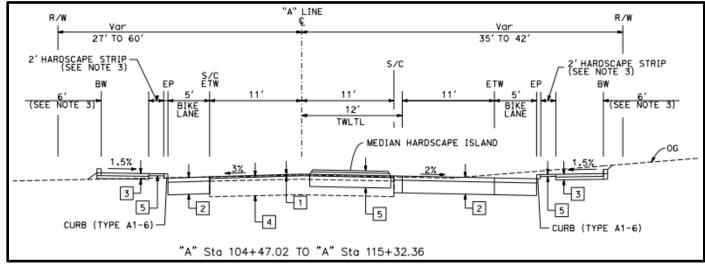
Project Report Cross Section at Surf Market (hardscape version).
